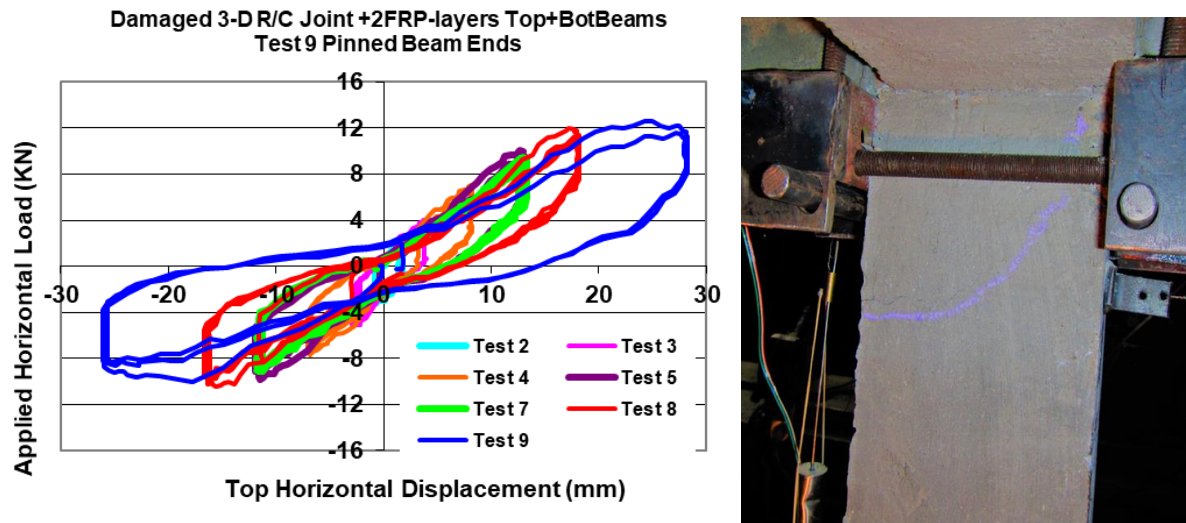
a) Cyclic load versus the corresponding horizontal displacement response of the RC beam-to-column joint with FRP strengthened beams. b) observed cracking at the East beam cross-section
